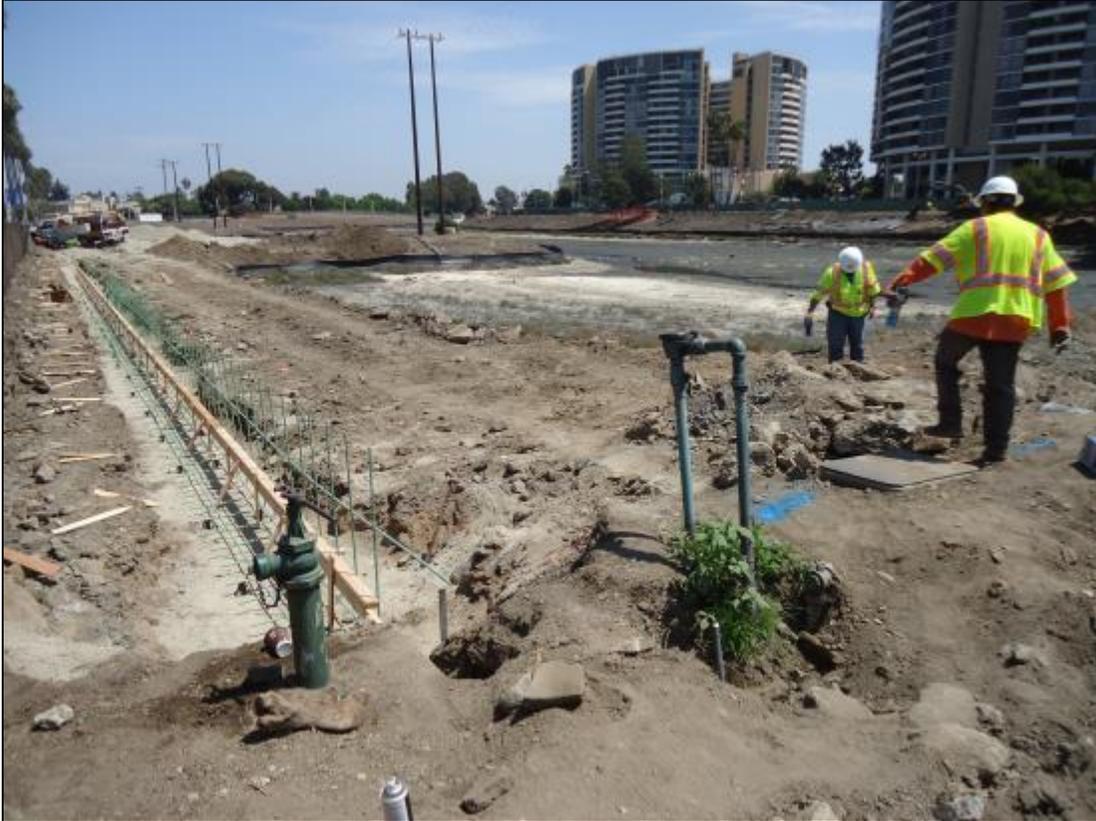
Photo facing east of CMB Construction crew installing rebar along Washington Avenue.
